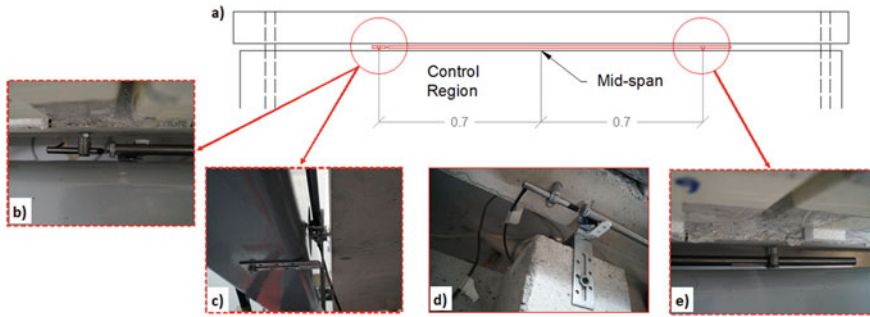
Longitudinal strains measurement system (final version): a outline; b detail of LVDT; c detail of roller support; d setup for unrestrained specimen; e fixed extremity
